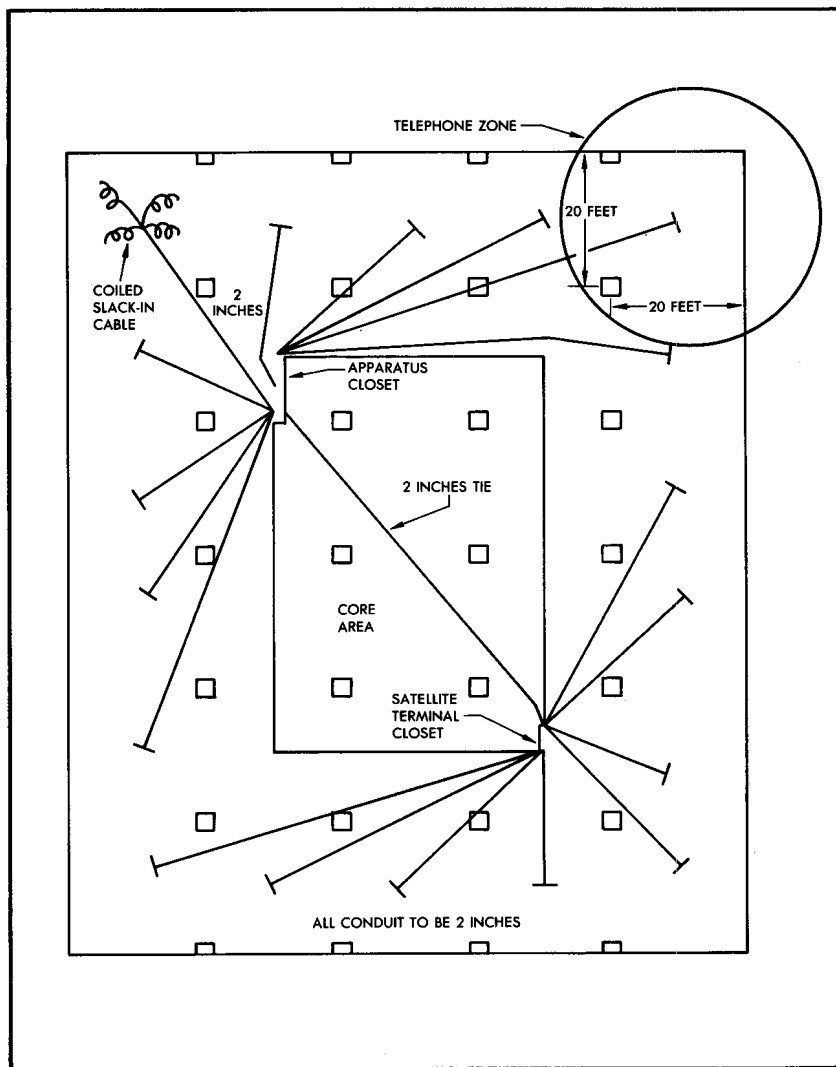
Typical Ceiling Distribution System Using Conduit to Telephone Zones
